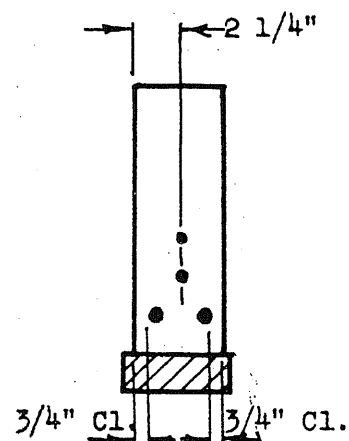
PLACEMENT OF REINFORCEMENT AND LOCATION OF STEEL STRAIN GAGES: BEAMS C-6 AND C-7
